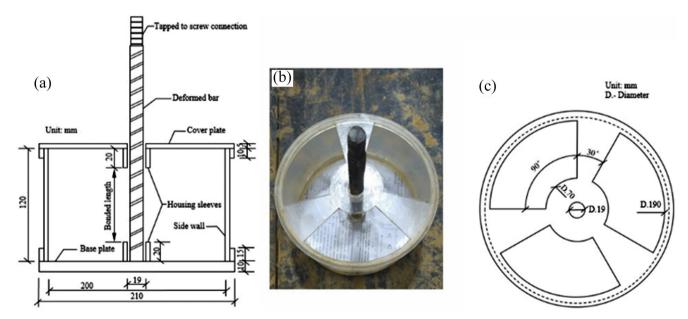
Pullout cell: (a) schematic of cross-sectional elevation; (b) 3D view of cell; (c) schematic of cross-sectional plan.
